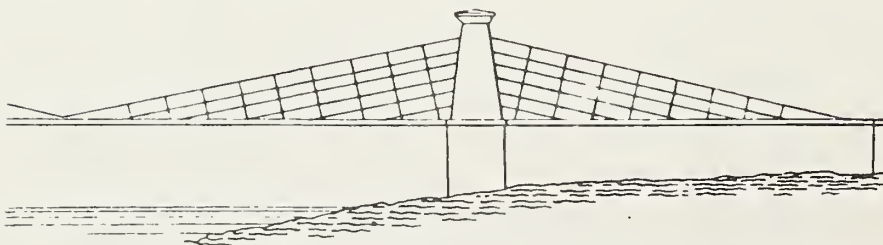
Harp-shaped Cable-stayed Bridge (Leonhardt⁽¹⁾)
